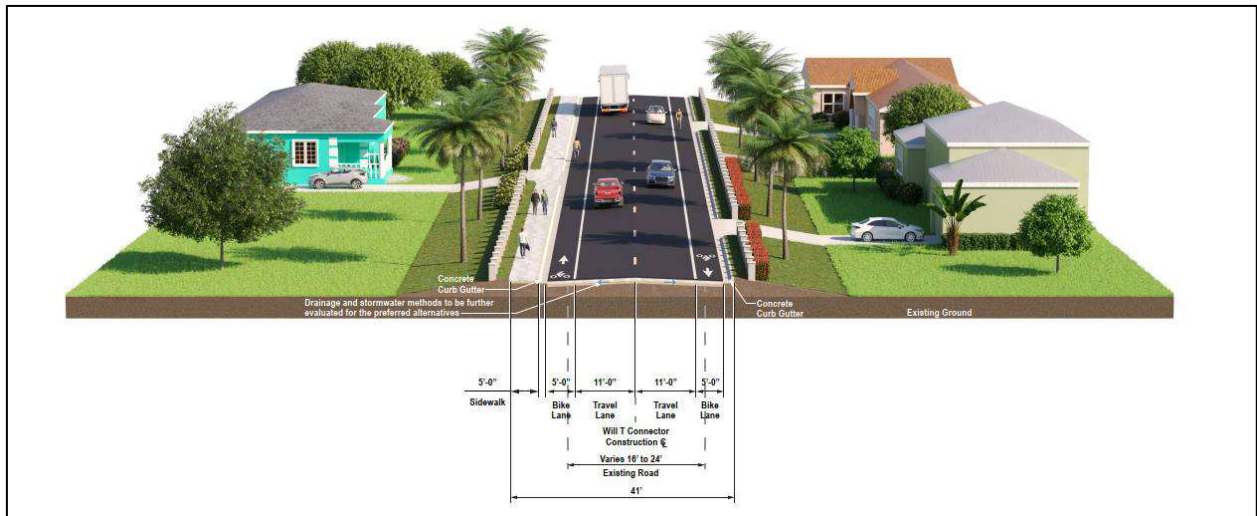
Will T Connector Typical Section for Alternatives B1, B2, B3 and B4
